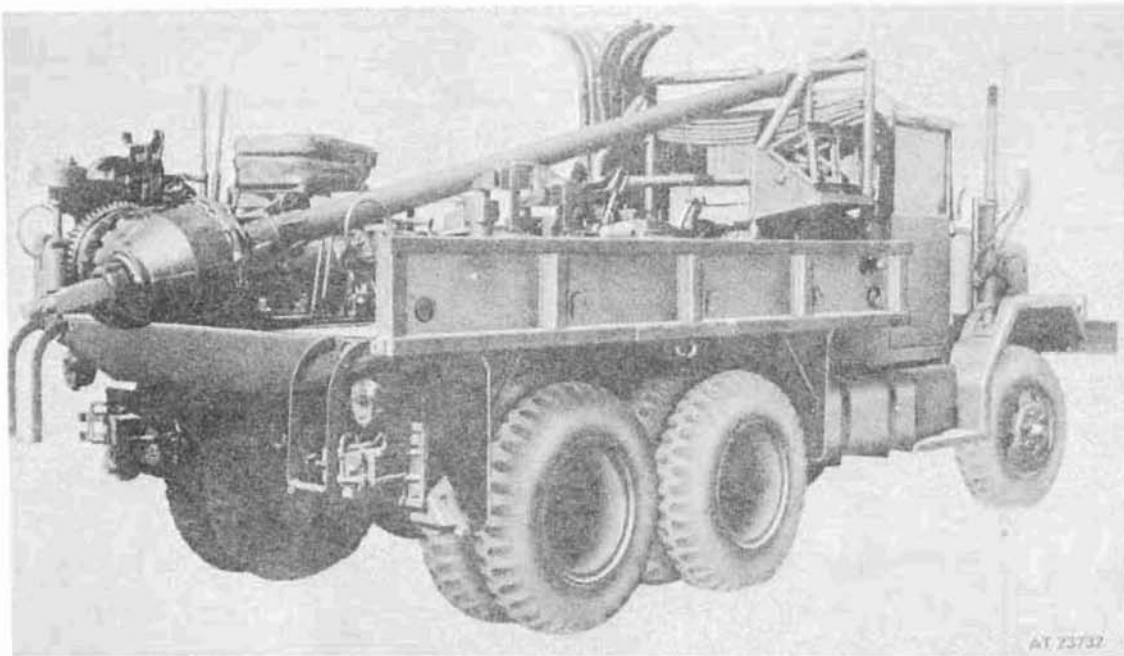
2-1/2 ton, 6x6, M764 earth boring machine and pole- setter truck - right rear view.
